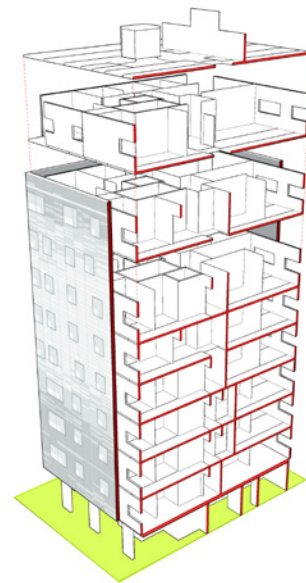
Cross-laminated timber loadbearing walls and floors (© Waugh Thistleton Architects)
